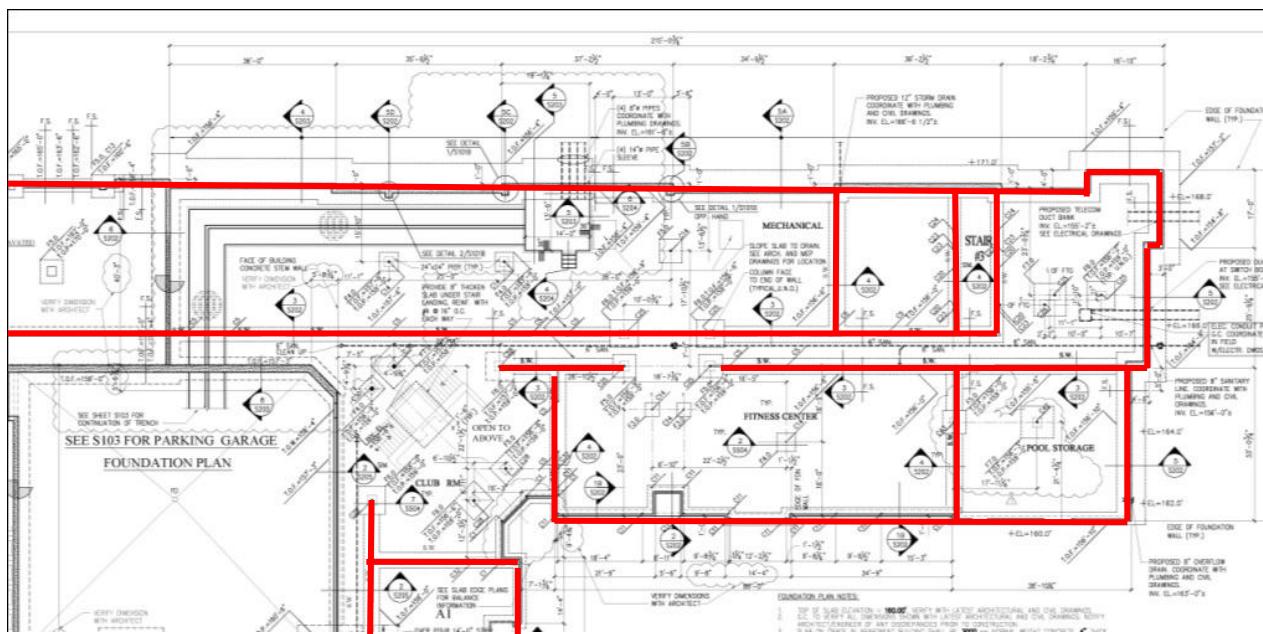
Foundation plan, Part of the east wing. Source: Construction documents by Cates Engineering.
